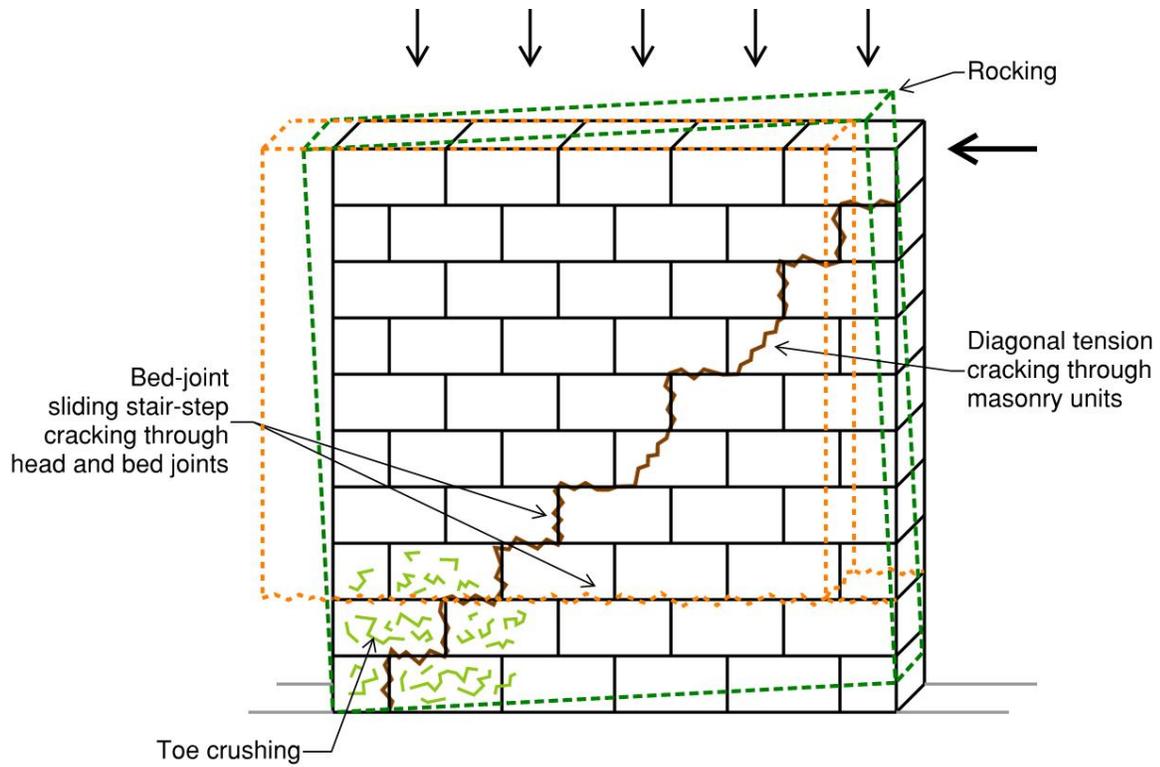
Failure mechanisms of a basic masonry wall or pier.
